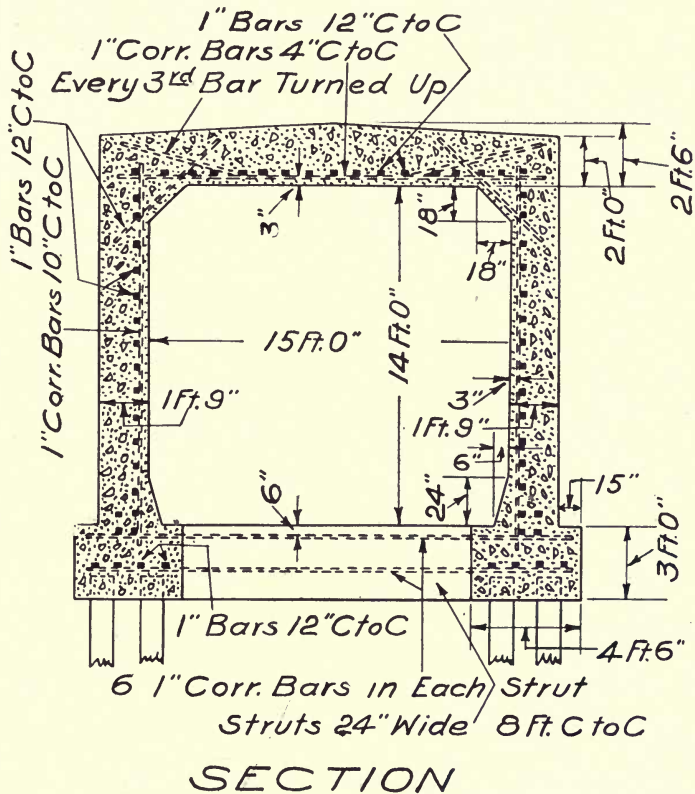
CROSS SECTION, INDIAN CREEK, CULVERT.
